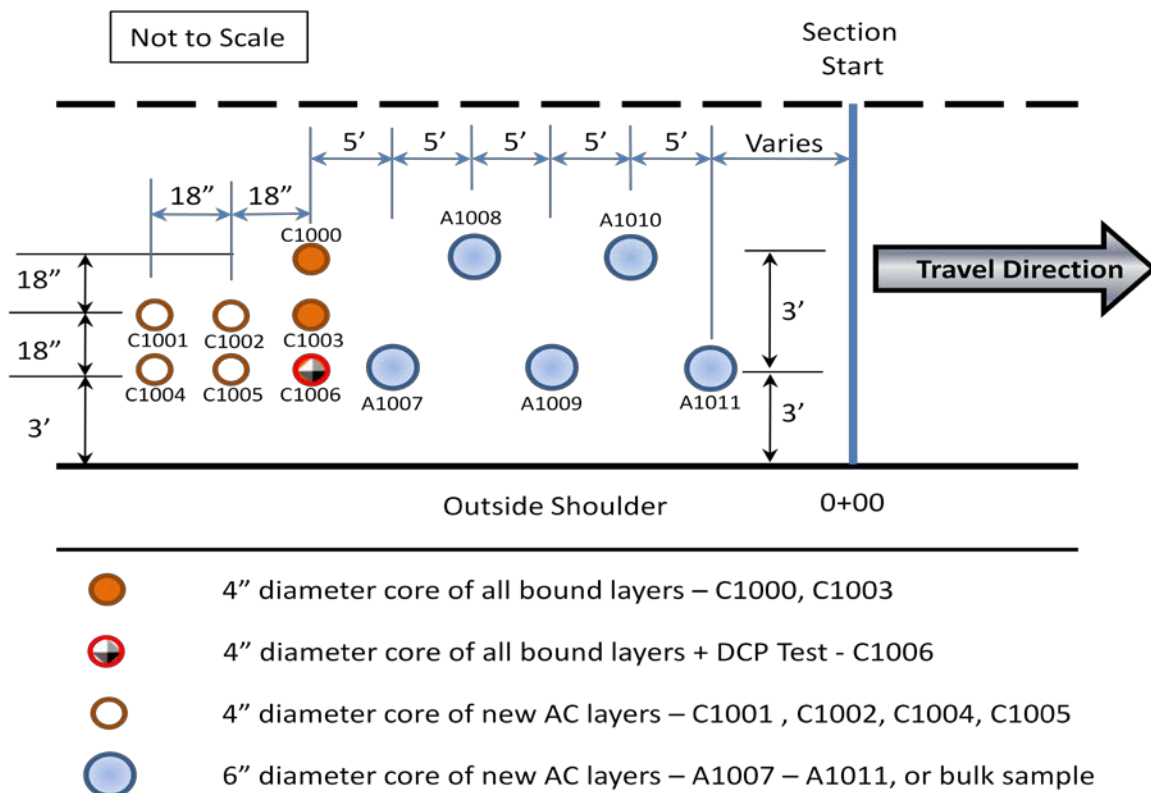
Standard sampling plan locations at approach end of test section for new AC overlays.
